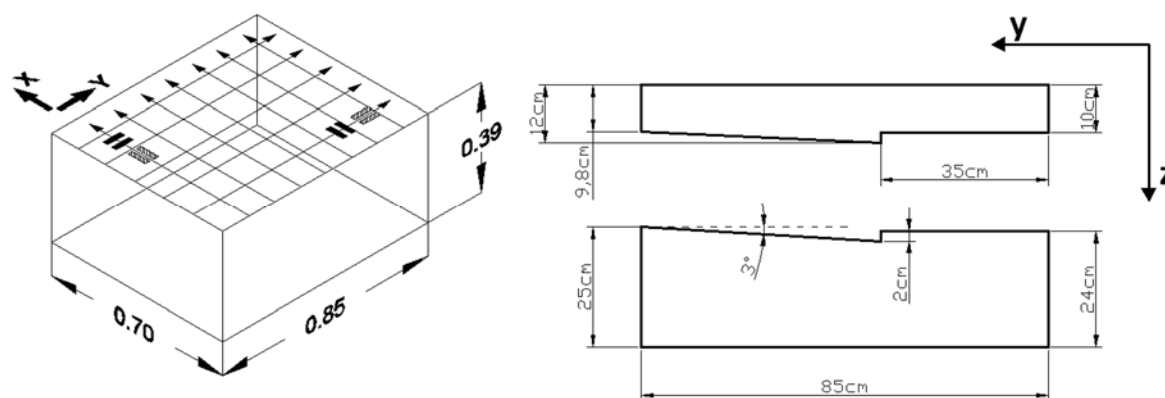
Measurements acquisition scheme on the intact block (a), scheme of the block cutting (b).
